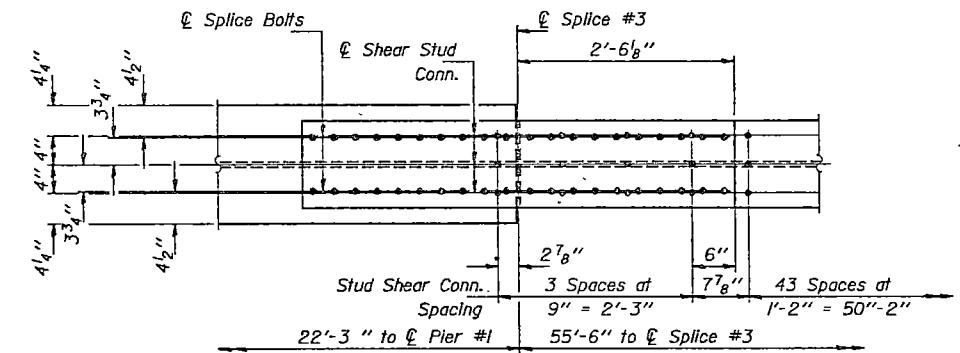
DETAIL OF REPAIR OF BEAMS AT WEST ABUTMENT
